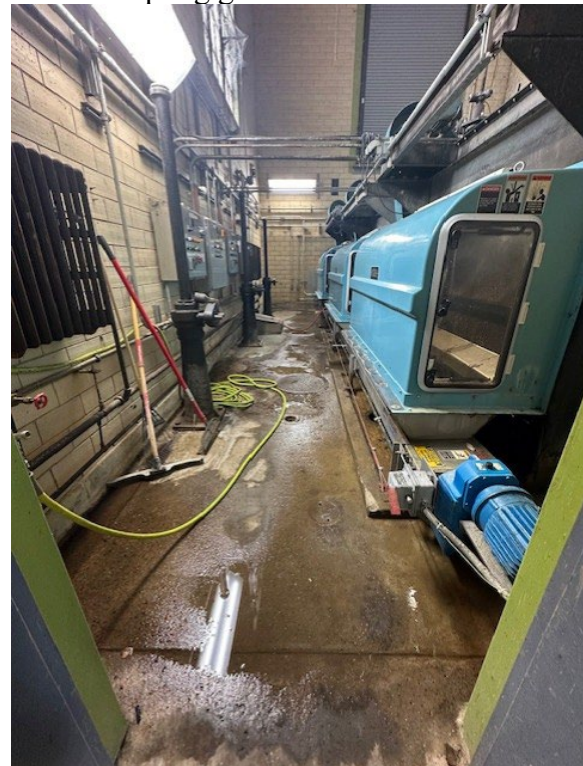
(Left): Screen Room on River Side looking North towards garage opening
